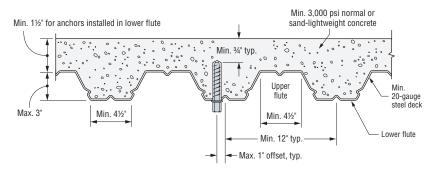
THD50234RH Installation in Concrete over Steel Deck
